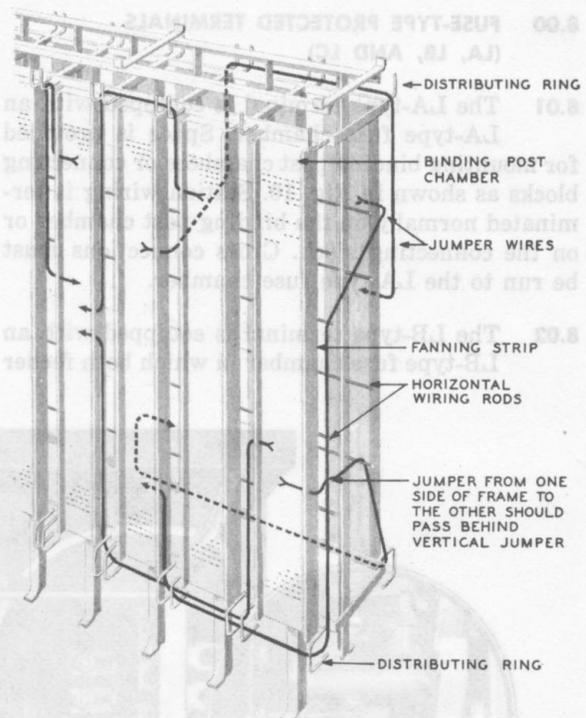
Cross-connection Arrangement on a Frame-type Terminal
